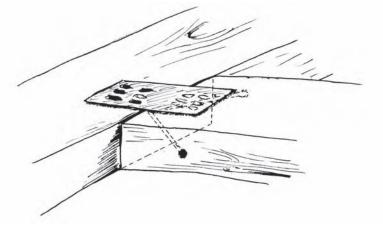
Joining of wall junctions at the top wall plate using a nail plate and two skew nails
